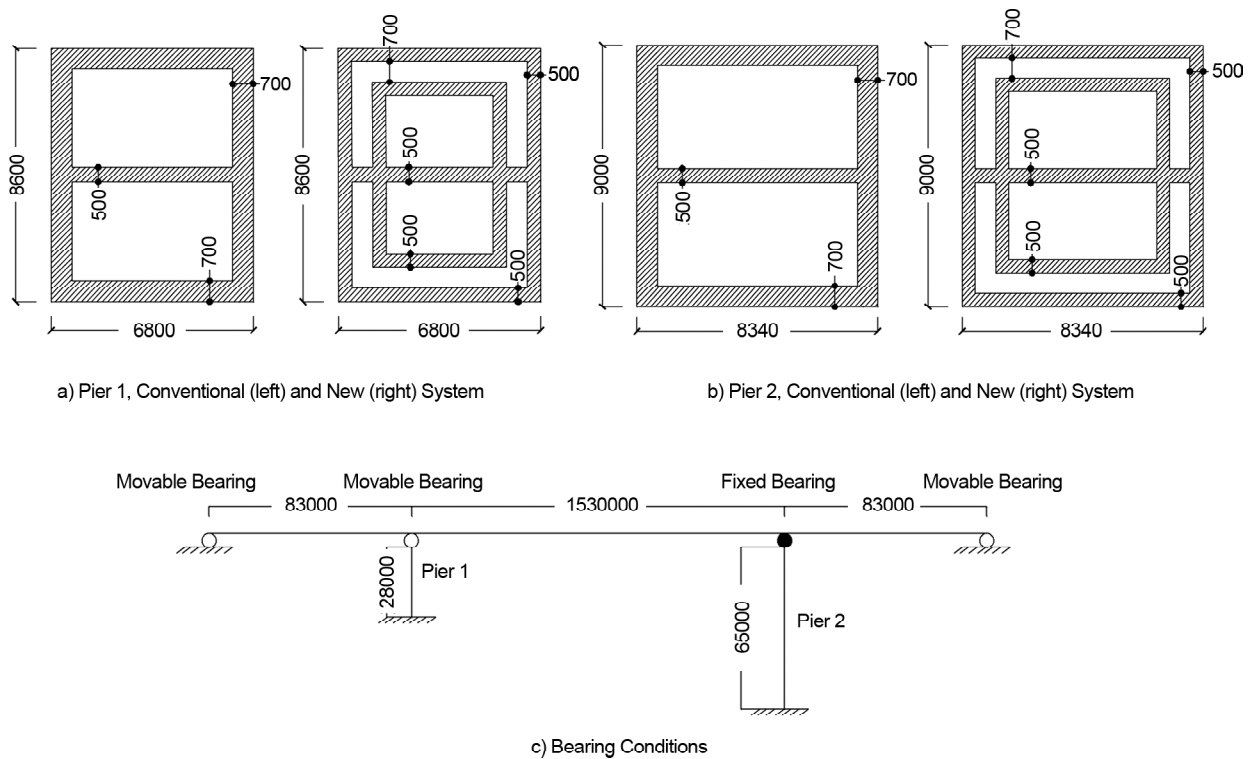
Bearing conditions and cross section of the piers for the BR-02 Bridge (Dimensions in millimetre).
